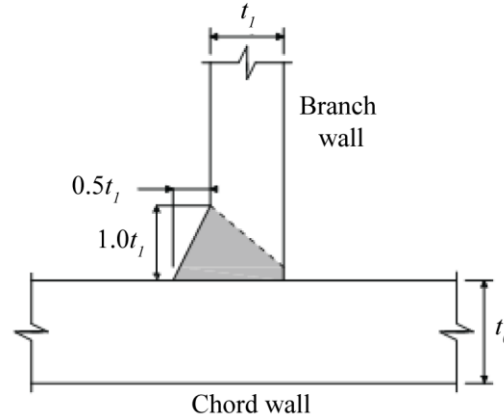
Weld dimensions (adapted from [27,28,30])
